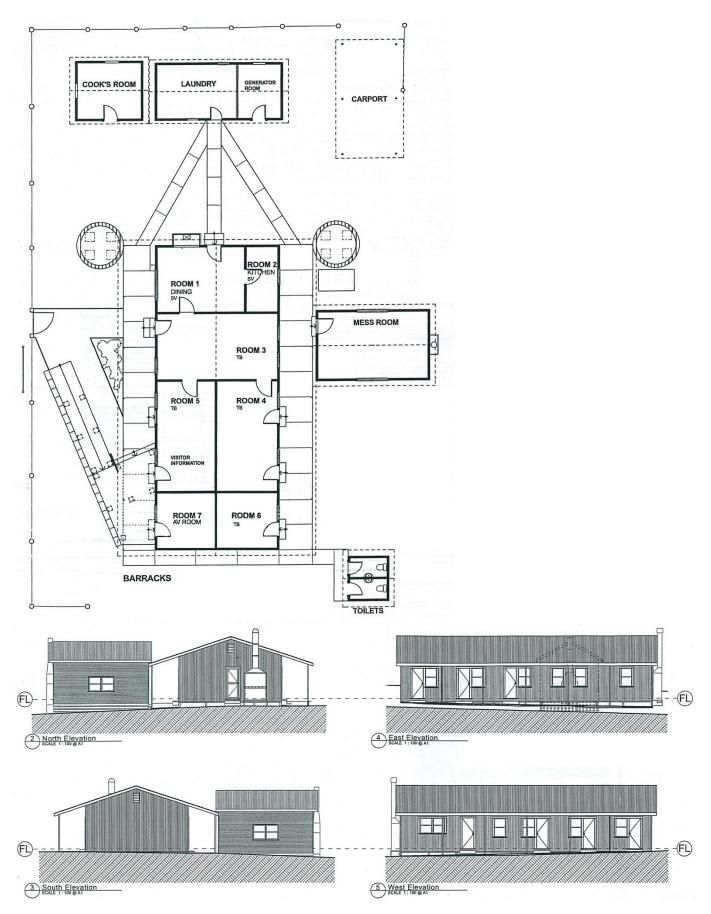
Homestead Group Staff Barracks plan & elevations. Cropped from works drawings prepared by Suters in 2007 Jean Rice Architect, site assessment 2009.
